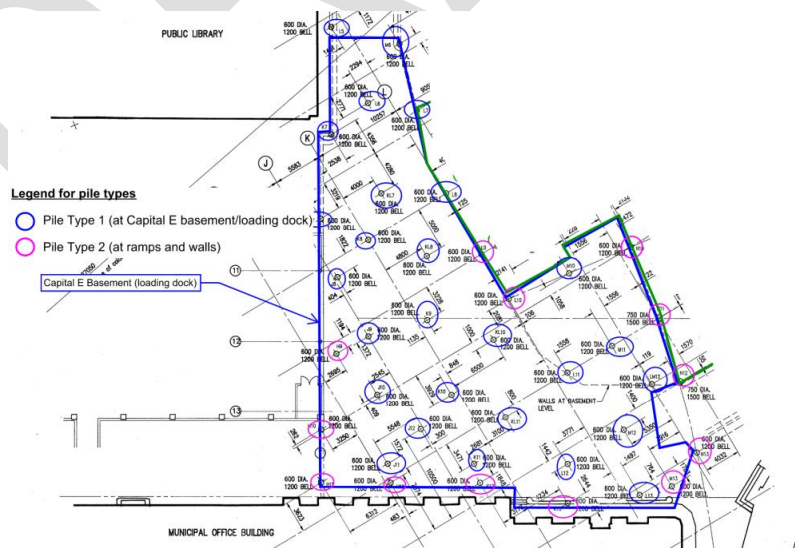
Plan of piles under retaining walls and within the internal basement slab
